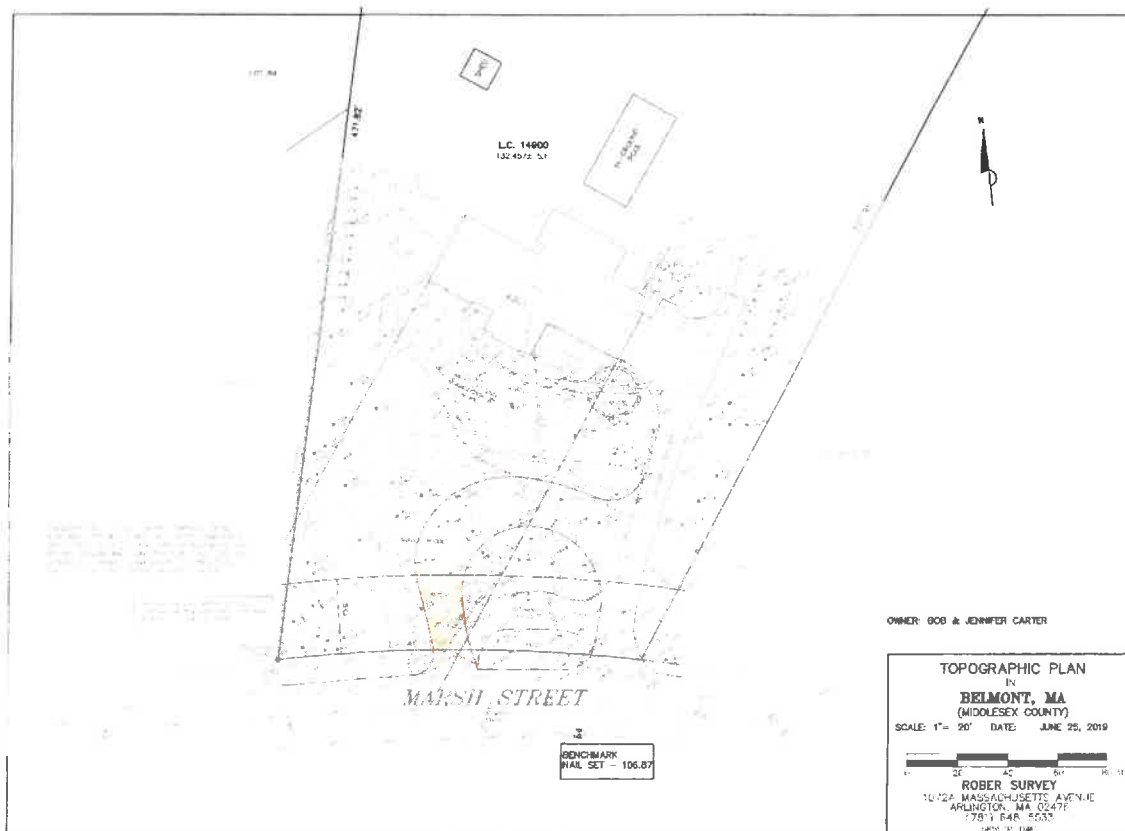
Proposed Driveway Plan. Yellow indicates area subject to special permit
